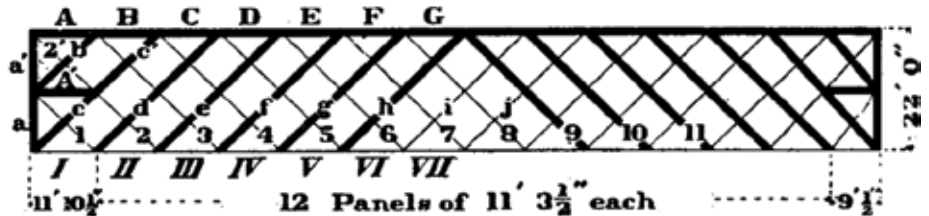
Diagram of a vertical-end lattice through-truss with a horizontal strut at end. Built over the Erie Canal in 1872 at Newark, New York. (Report of the Board of Railroad Commissioners of the State of New York, 1891.)
